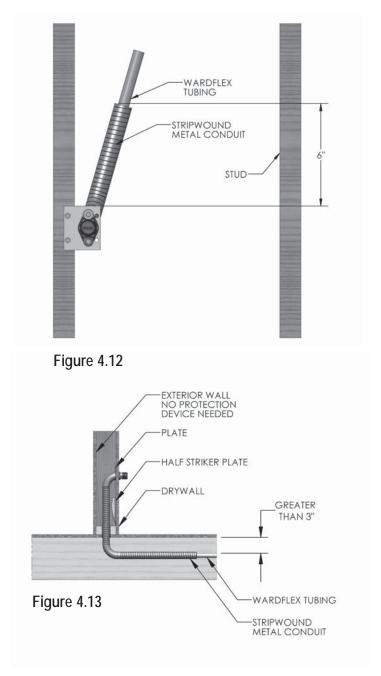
Termination fitting for an appliance connection with stripwound conduit providing extra protection inside the wall and floor cavities.
